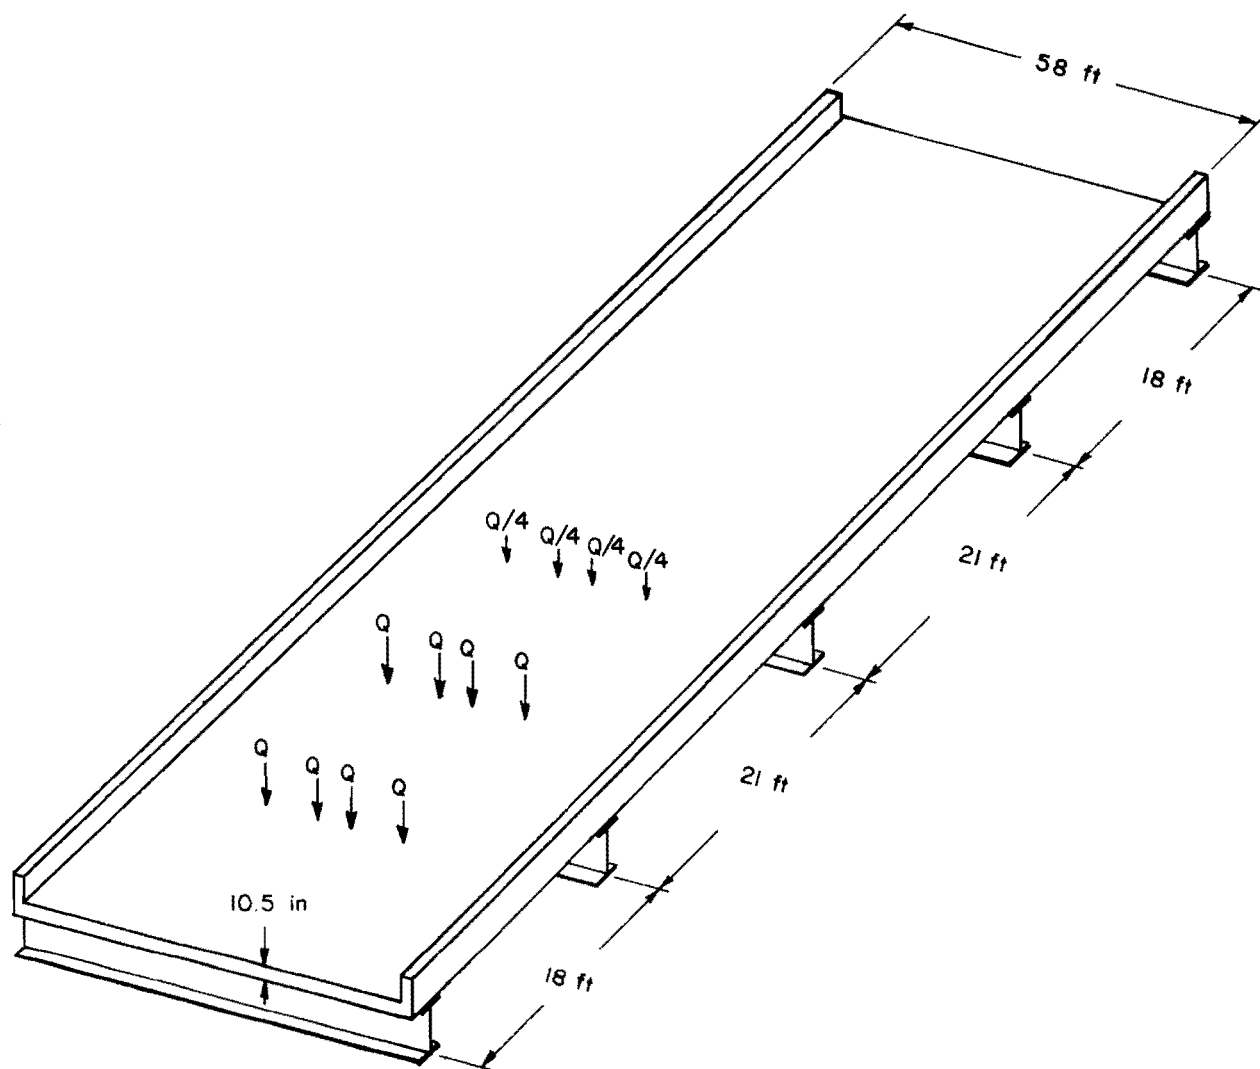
A typical one-way bridge deck reinforced parallel to traffic.
